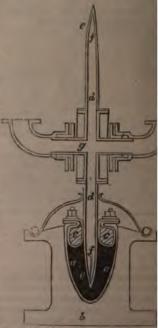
represents a transverse section of the tube, and of the arm by which the piston is connected with the leading carriage of the train; fig. 2 is a longitudinal section of the tube and piston; and fig. 3 is a plan of the tube and of the piston arm. a is the tube, having a slit or opening for the passage of the
